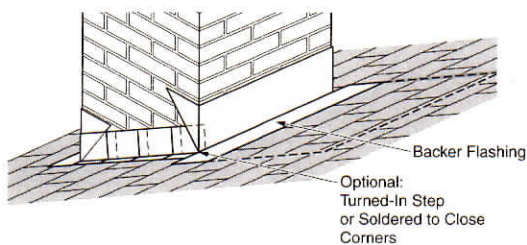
Example of sheet metal back flashing for upslope portion of masonry chimney.
